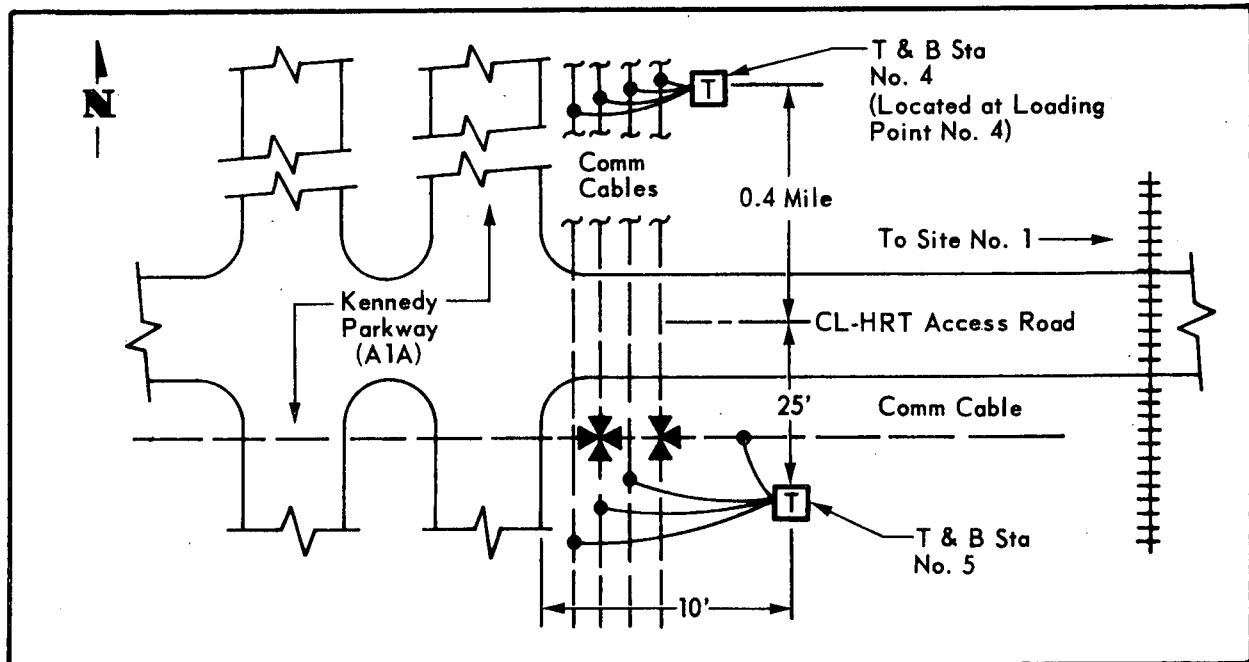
Test and Bond Stations No. 4 and 5 Equipment Locator
